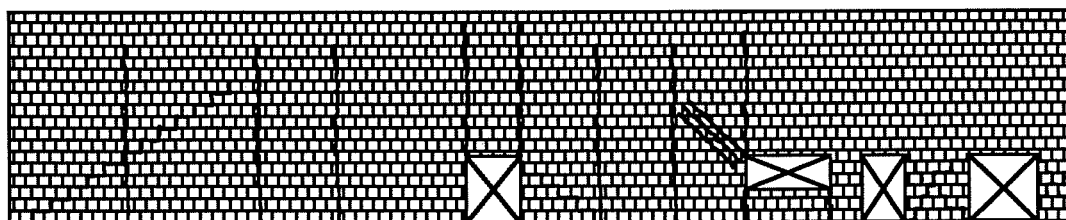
Loma Prieta Community Center - Observed cracks in west gymnasium wall
